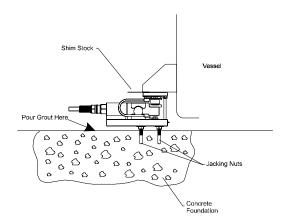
ADJUSTING FOR LEVEL WITH SHIM STOCK
